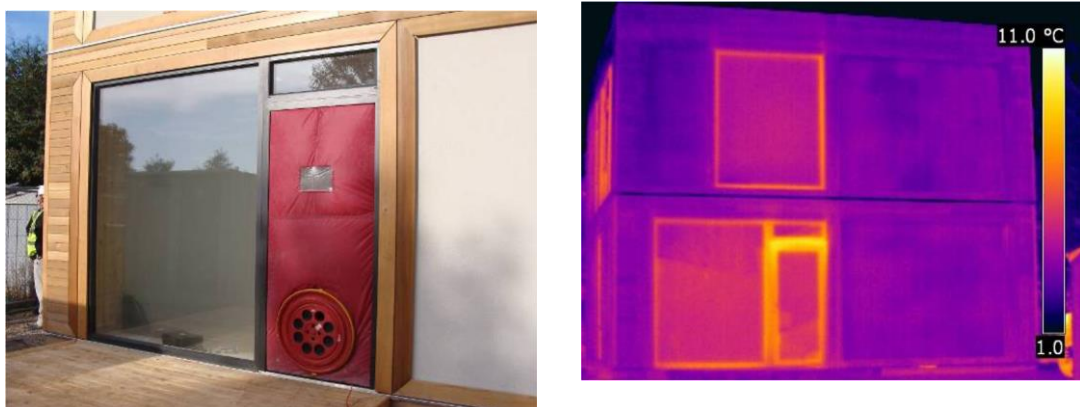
Airtightness test, BaleHaus, University of Bath, 2009 Photos Peter Walker Thermal Camera Image of BaleHaus East facade, University of Bath, 2010
